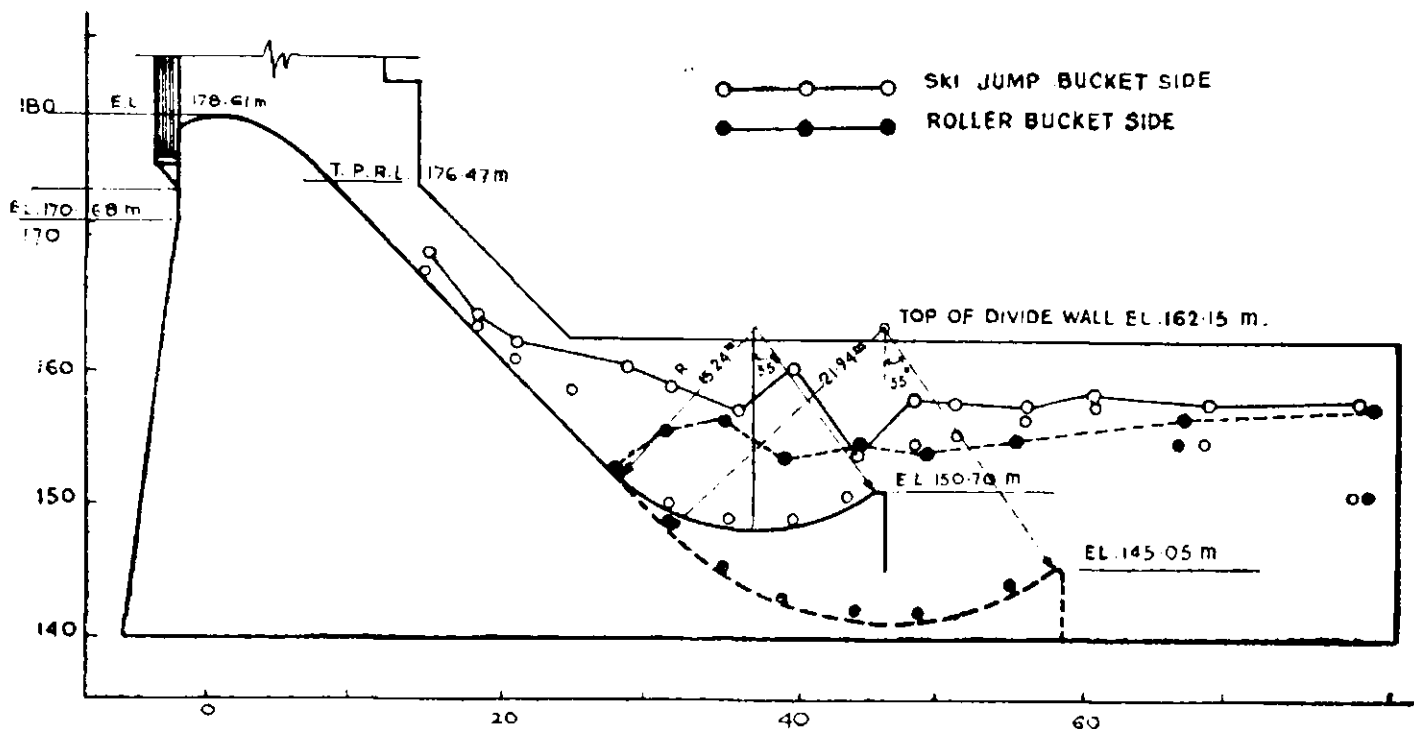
Pressure distribution on sides of the divide wall between the buckets.
